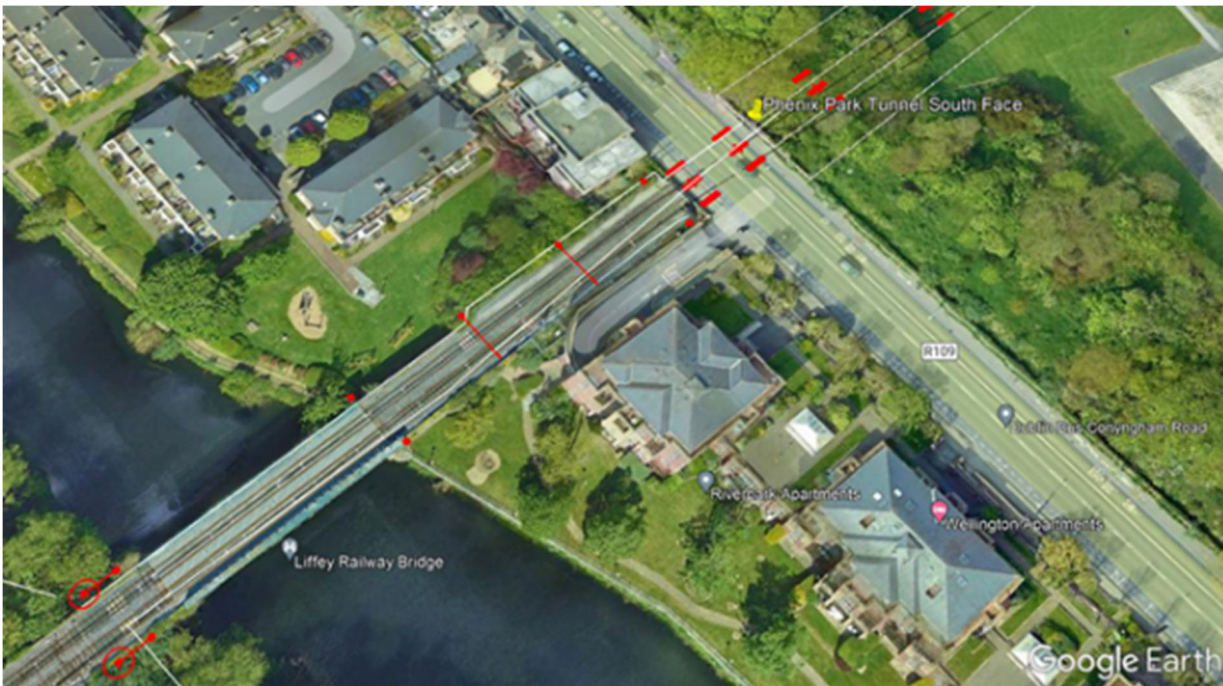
OHLE Mast Position for Liffey Bridge (UBO1) and Conyngham Road Bridge (OBO2)
